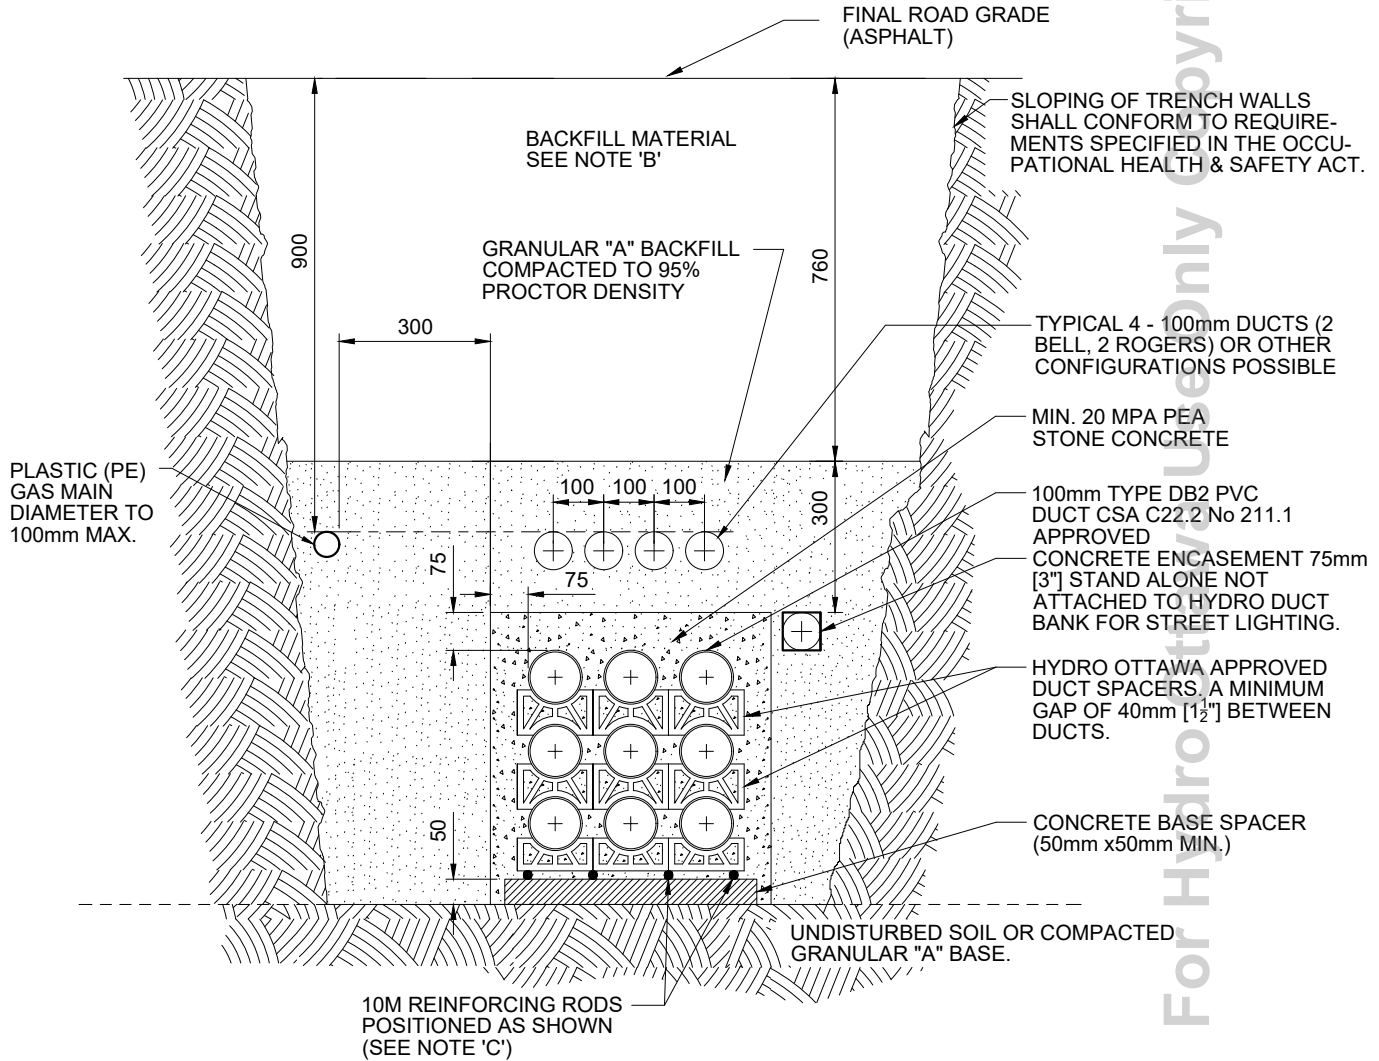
TYPICAL CONCRETE DUCT BANK SECTION VIEW
